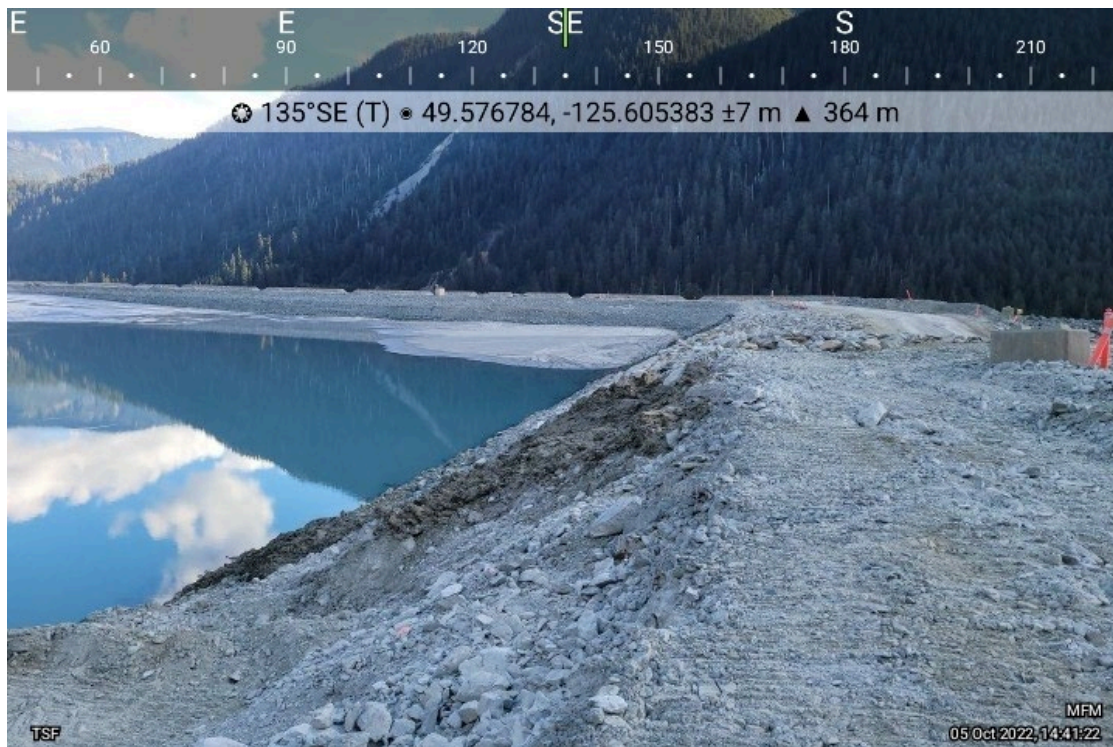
Lynx TDF looking southeast with the boundary of the tailings pond at the west end of the TDF covering about 2/3 of the tailings surface.
